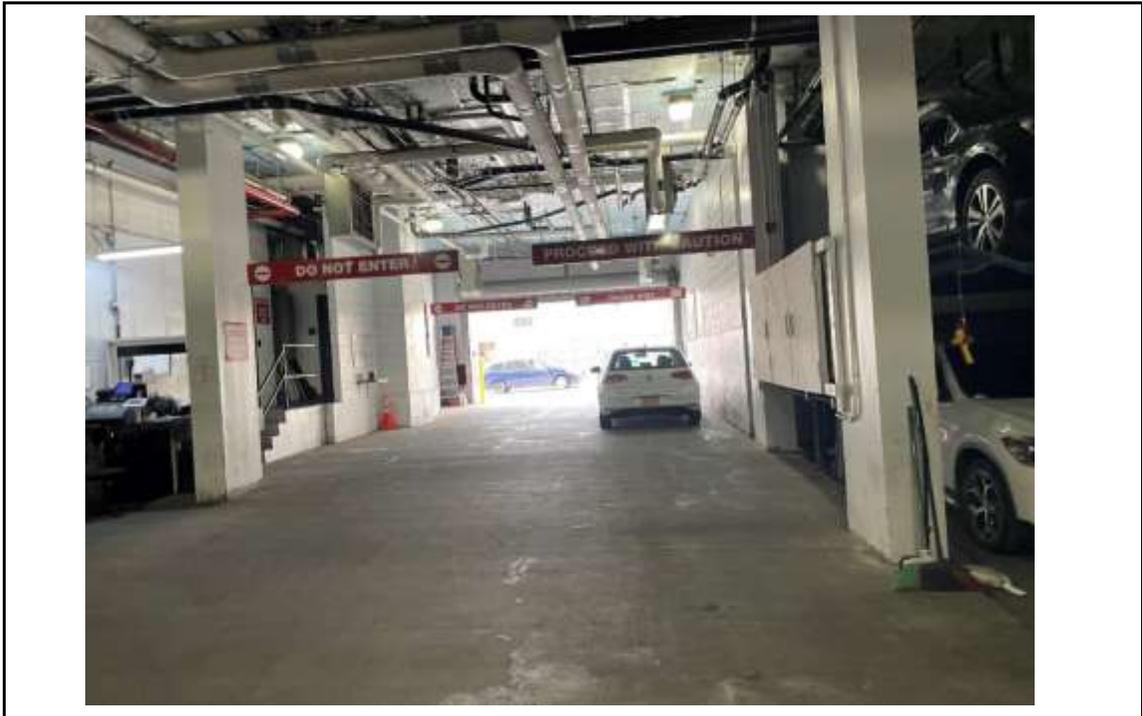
Subgrade parking garage concrete slab, facing north. 20 June 2022.
